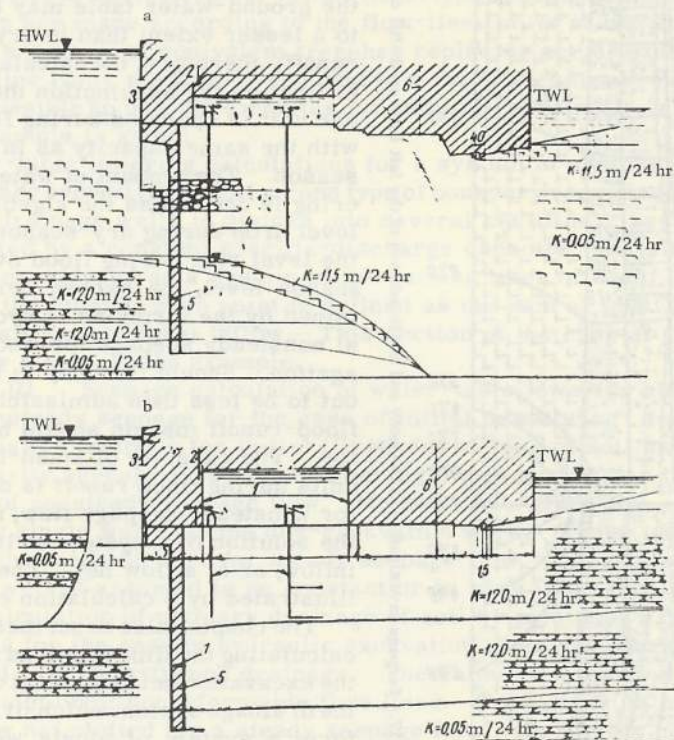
Determination of uplift pressure on the underground structures of concrete dams and powerhouses of the HEP
